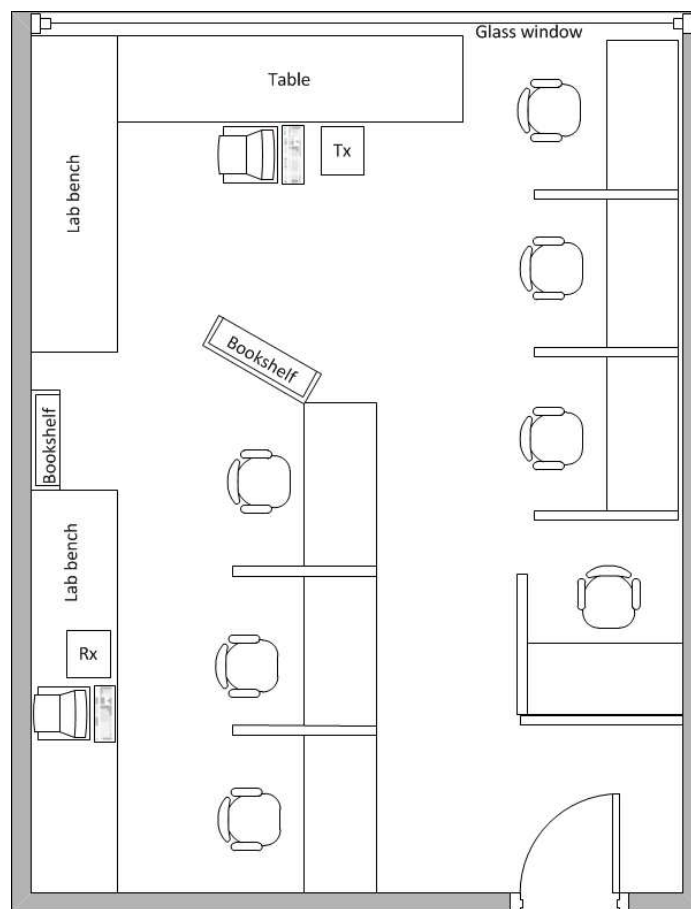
Floor plan of the indoor NLOS environment (9.1 m  $\times$  7.0 m)
